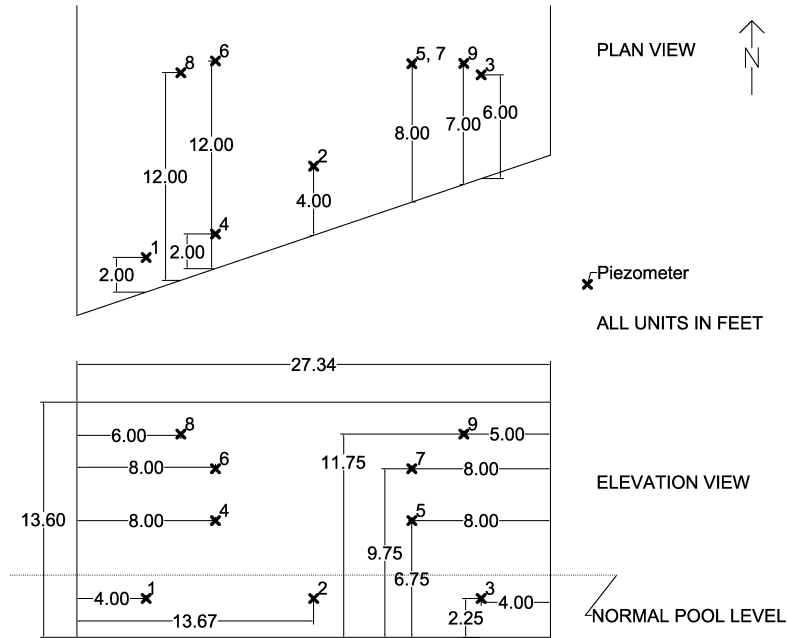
Piezometer locations within north abutment: plan view (top) and elevation view (bottom)
